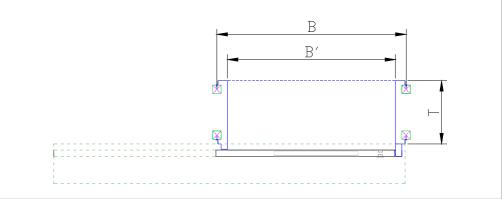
DS single-leaf sliding door and frame for Inwall OT, top view
